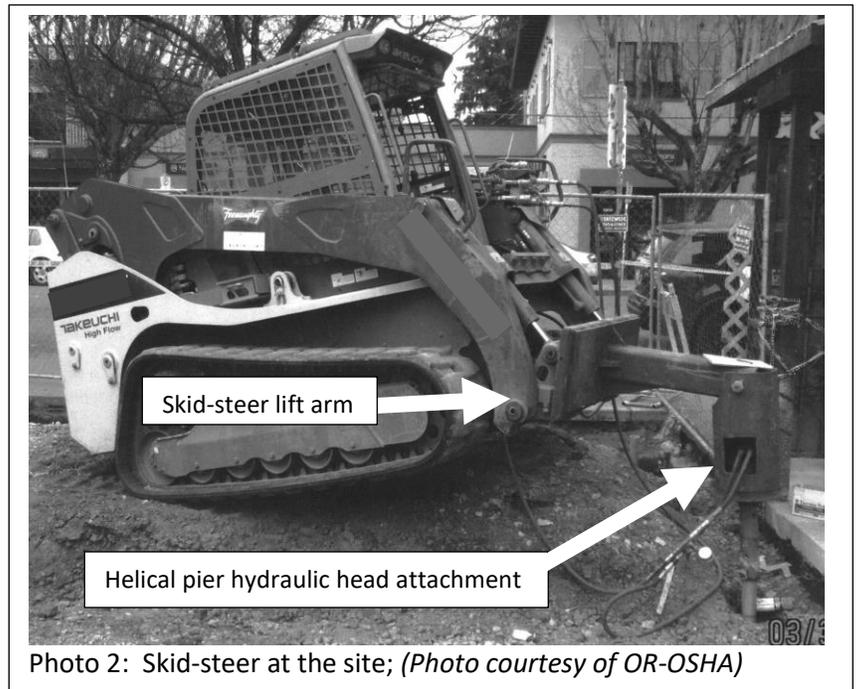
Skid-steer at the site; (Photo courtesy of OR-OSHA)
